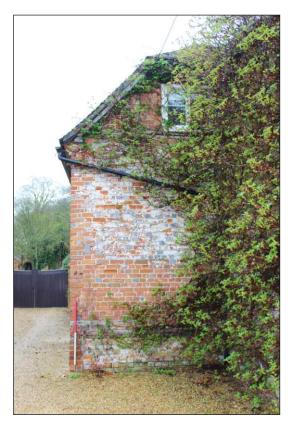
North end of west exterior elevation, looking east. (1m scale)
